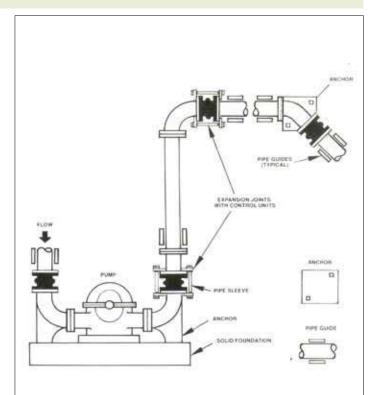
Figure B: Typical Piping Layout Showing Use of Control Units When Proper System Anchoring is Limited.
